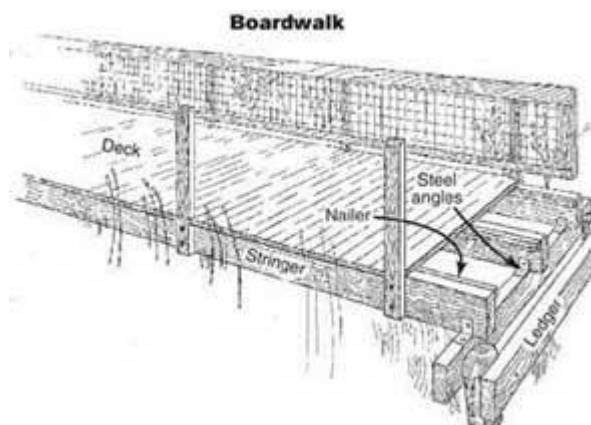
Details of boardwalk construction. Large stringers and ledgers connected with steel angles and nailers help increase the life of the stringers.
